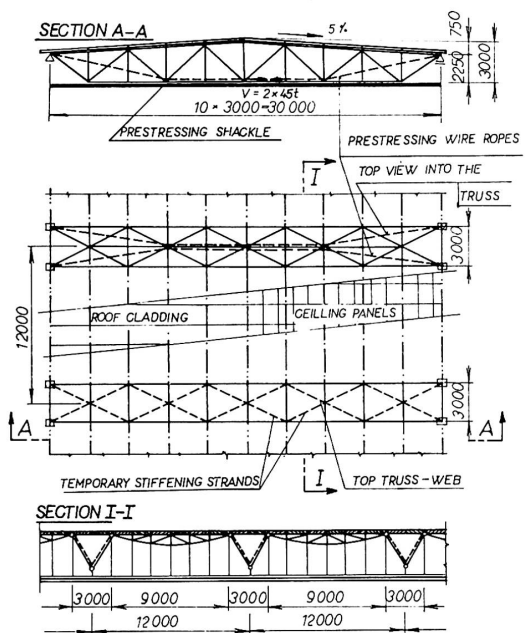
Tubular roof truss prestressed by two polygonal tendons
